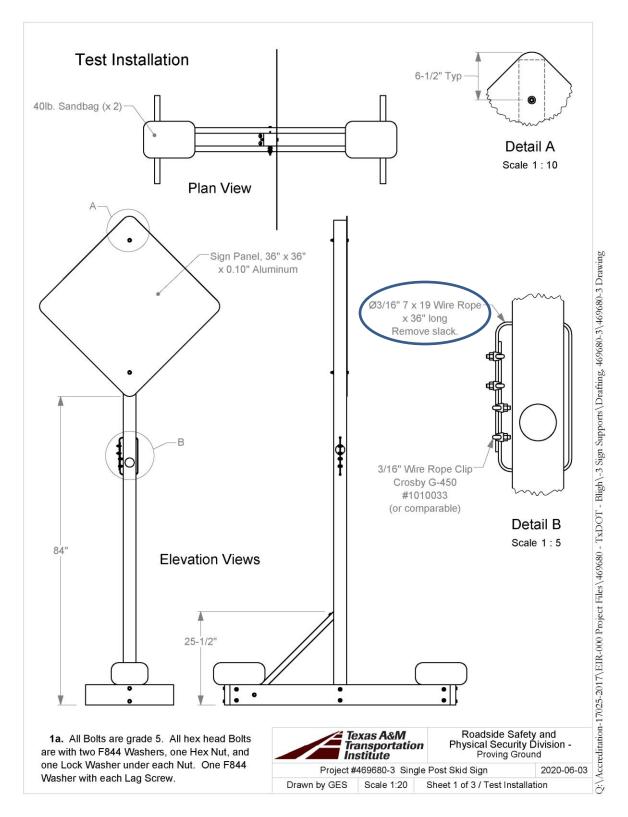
Modified TxDOT Single Skid-Mounted Sign Support Details (First Modification) for Crash Test 469680-03-2A.
